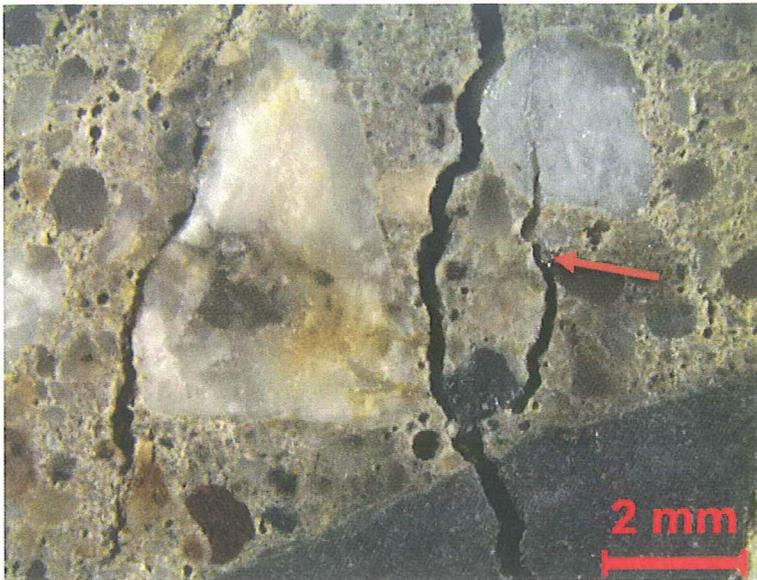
Lapped section of Core 8 AB showing branch out of the longitudinal crack (arrow).
